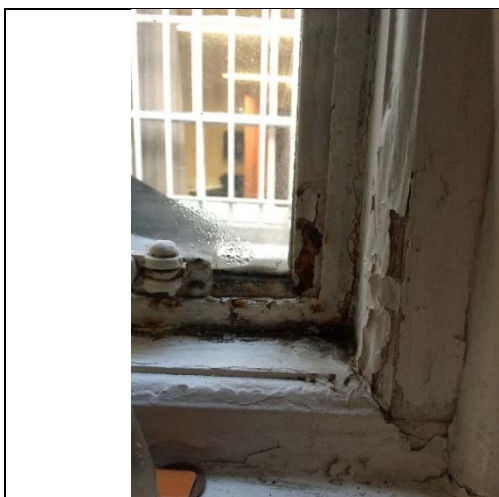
Existing Crittall windows to be replaced, overlooking an internal flat roof area.
